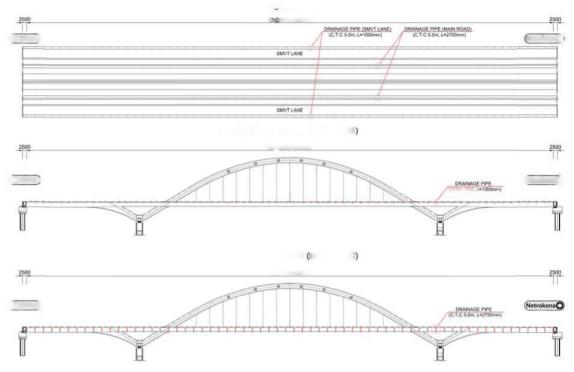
Current Drainage Plan of the Kewatkhali Main Bridge (2)
